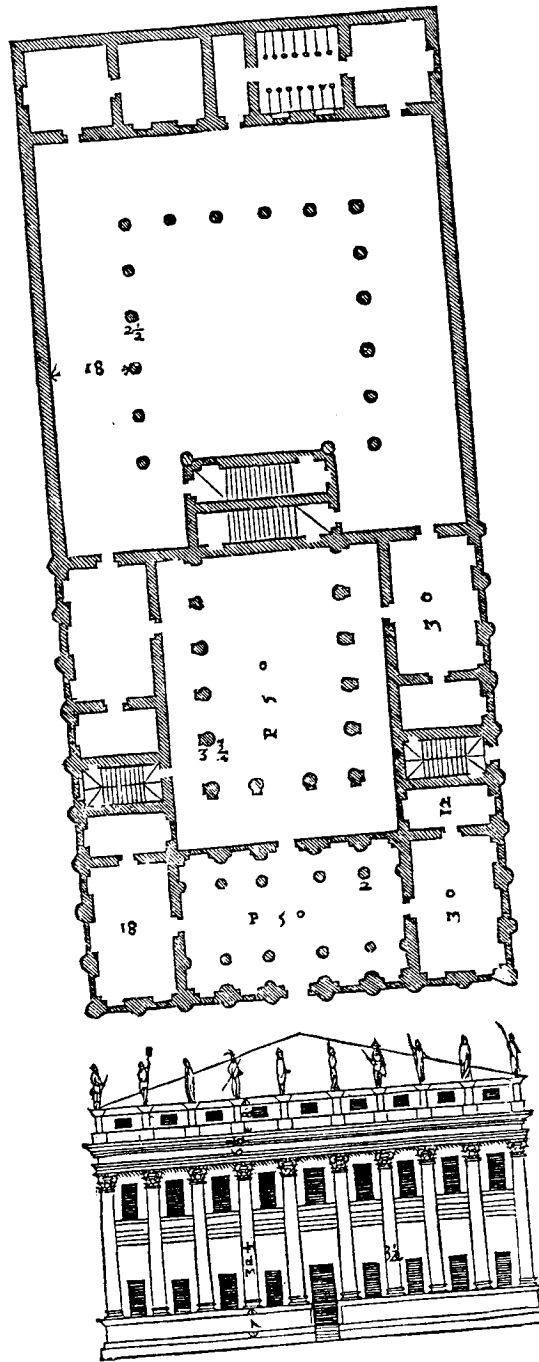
Andrea Palladio: plan and facade of Palazzo Angarano (from "Quattro Libri")
